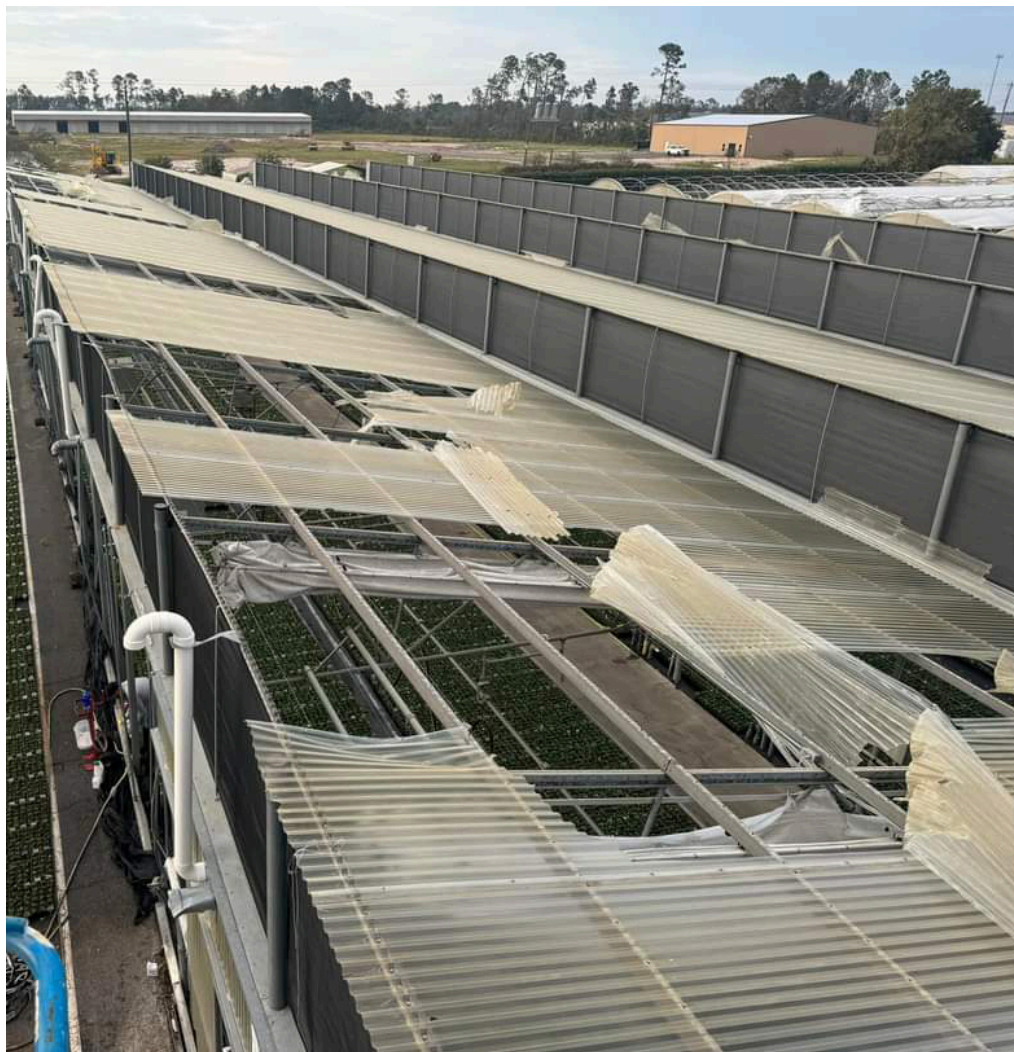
Roof Damage Exposes Growing Plants to Direct Sunlight. Photo: Sunbelt Greenhouse.
